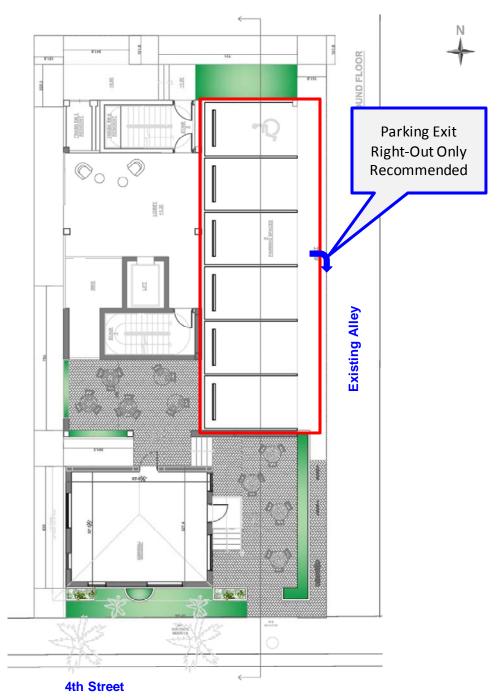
depicts the site's location map while Figure 2 is the site plan provided for illustrative purposes only, we refer you to the full-scale Site Plan for more specific details.
